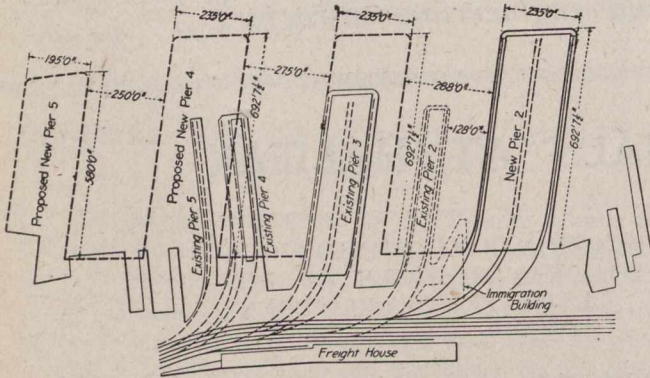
General Plan of Development—Existing Piers Shown Dotted.
